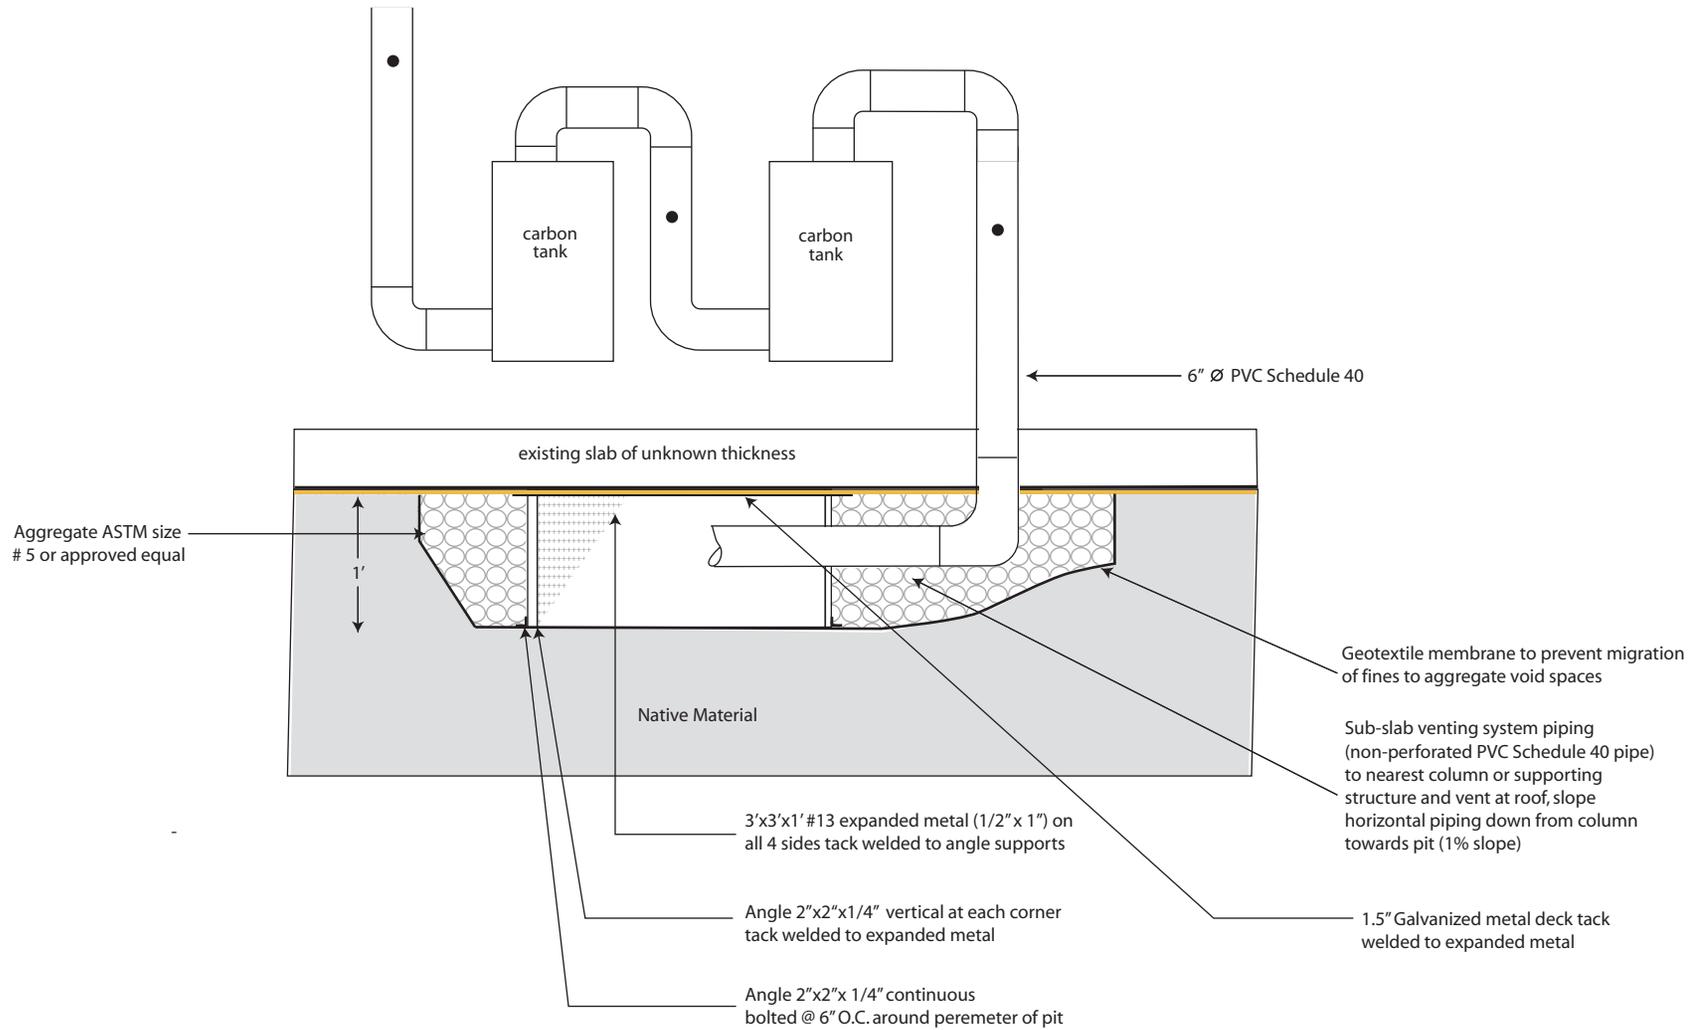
B: Enhanced Subslab Depressurization System - Detail #3
